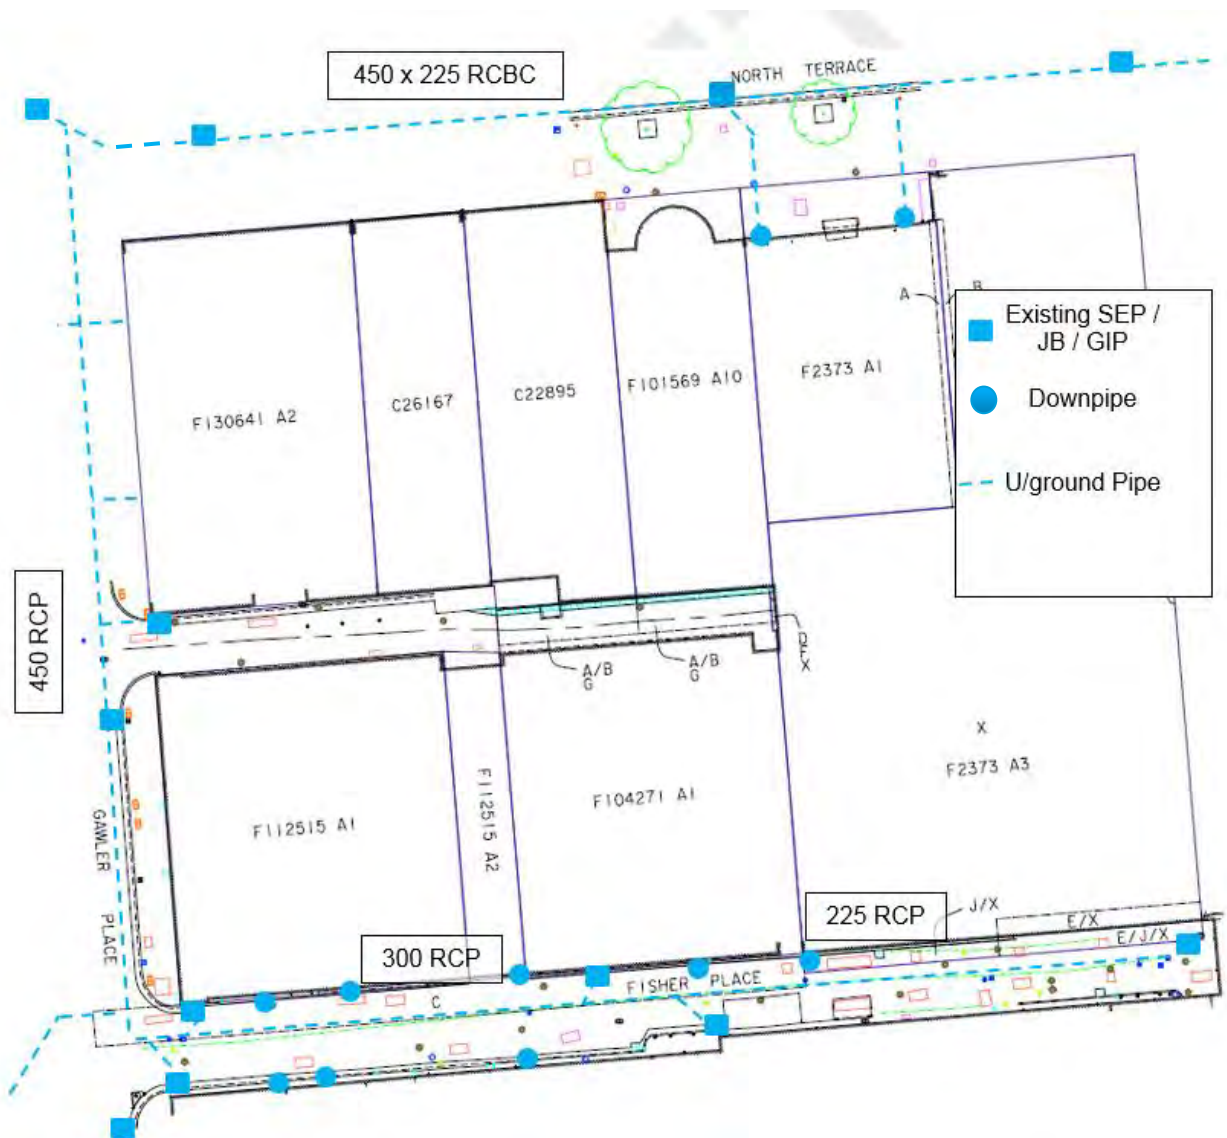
Existing Drainage Infrastructure in the Surrounding Roads
